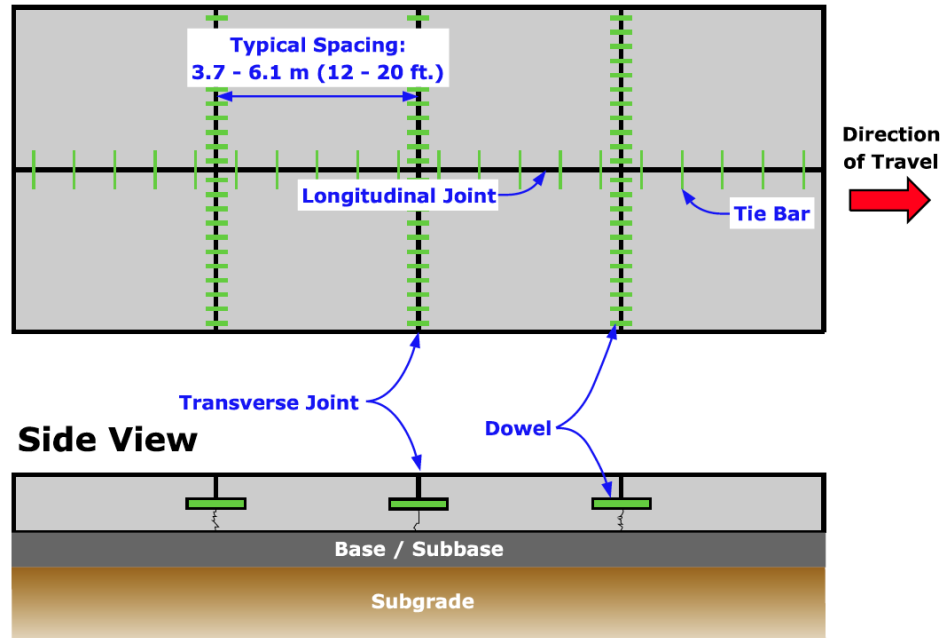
Schematic of jointed plain concrete pavement (JPCP) joints and layers (Pavement Interactive, 2007a)
